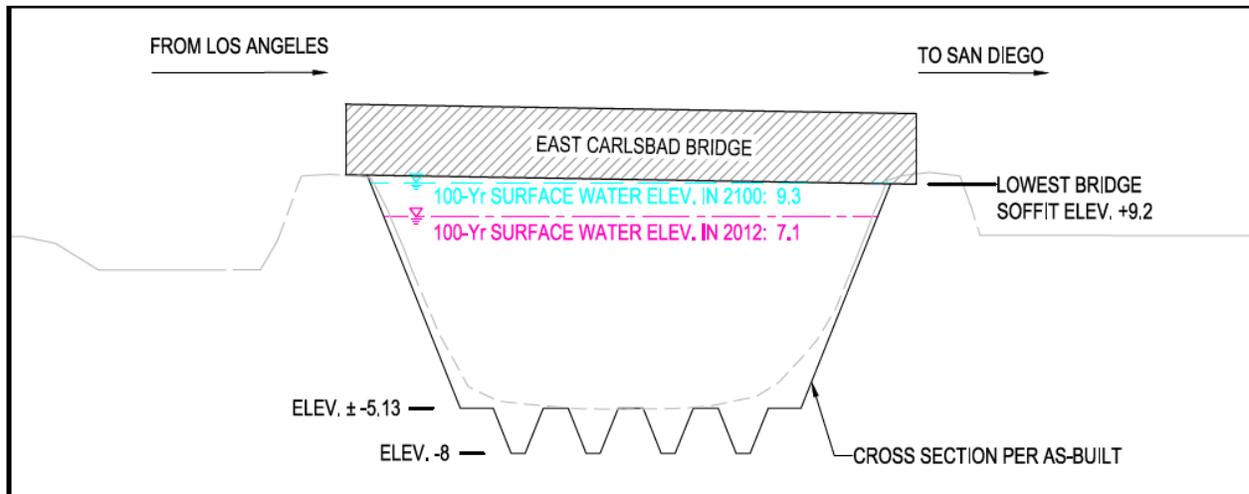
Channel Cross Section Under East Carlsbad Boulevard Bridge
